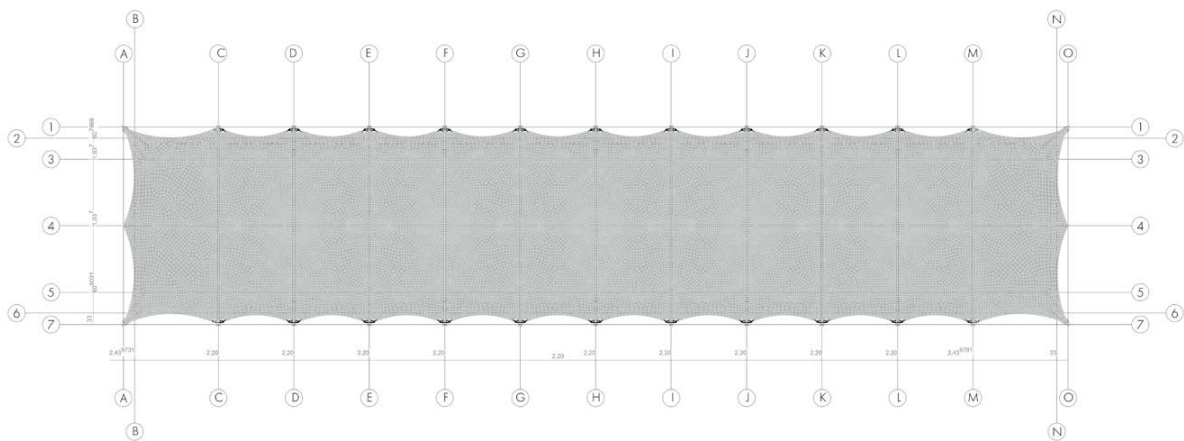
Membrane roof, roof view, source: HFT Stuttgart
